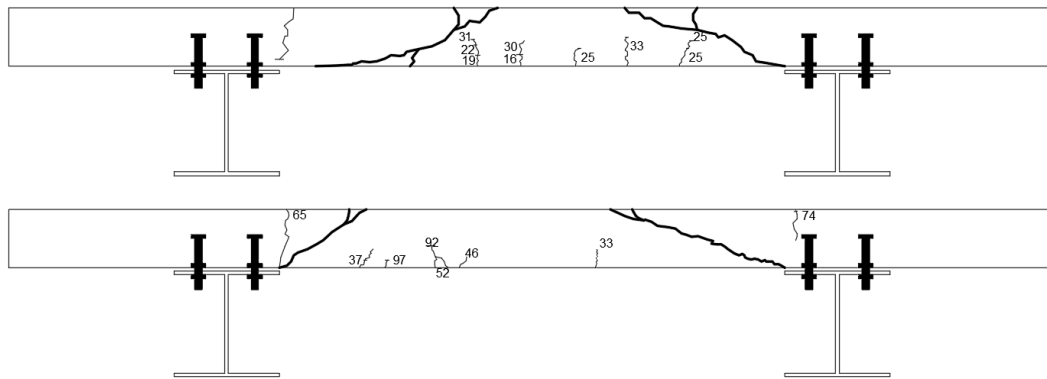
Crack mapping and failure mode of a single-span bridge deck Prototype 2.
